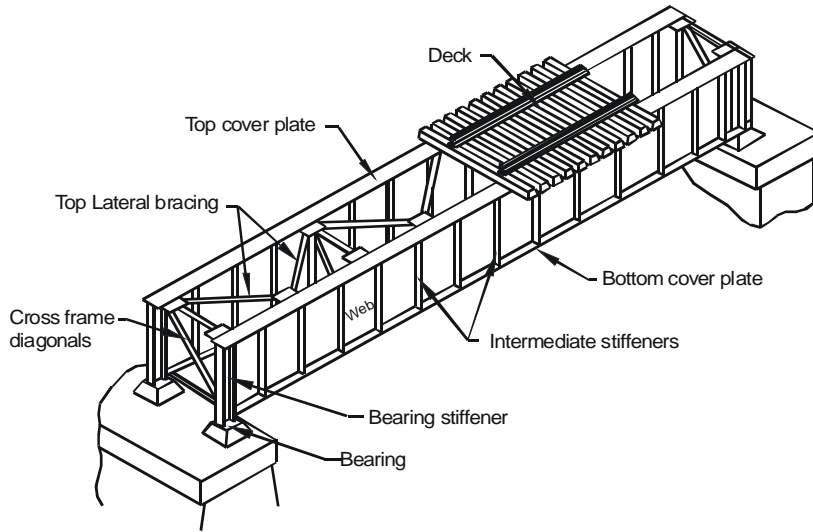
Isometric view showing various parts of a welded plate girder
